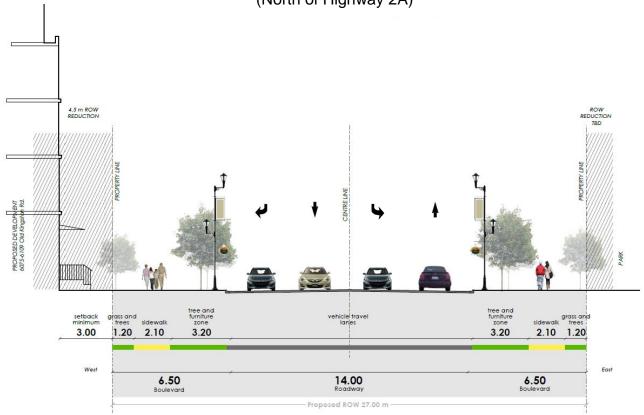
illustrates the existing and proposed cross-section for the Highland Creek Overpass to the north of the intersection with Highway 2A.
